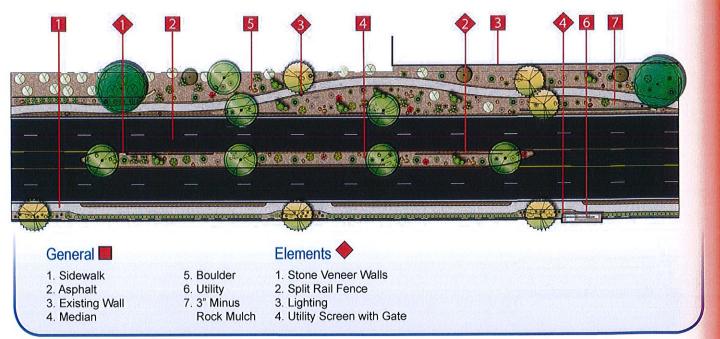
"Better" Rural Elegance Conceptual Streetscape Plan
